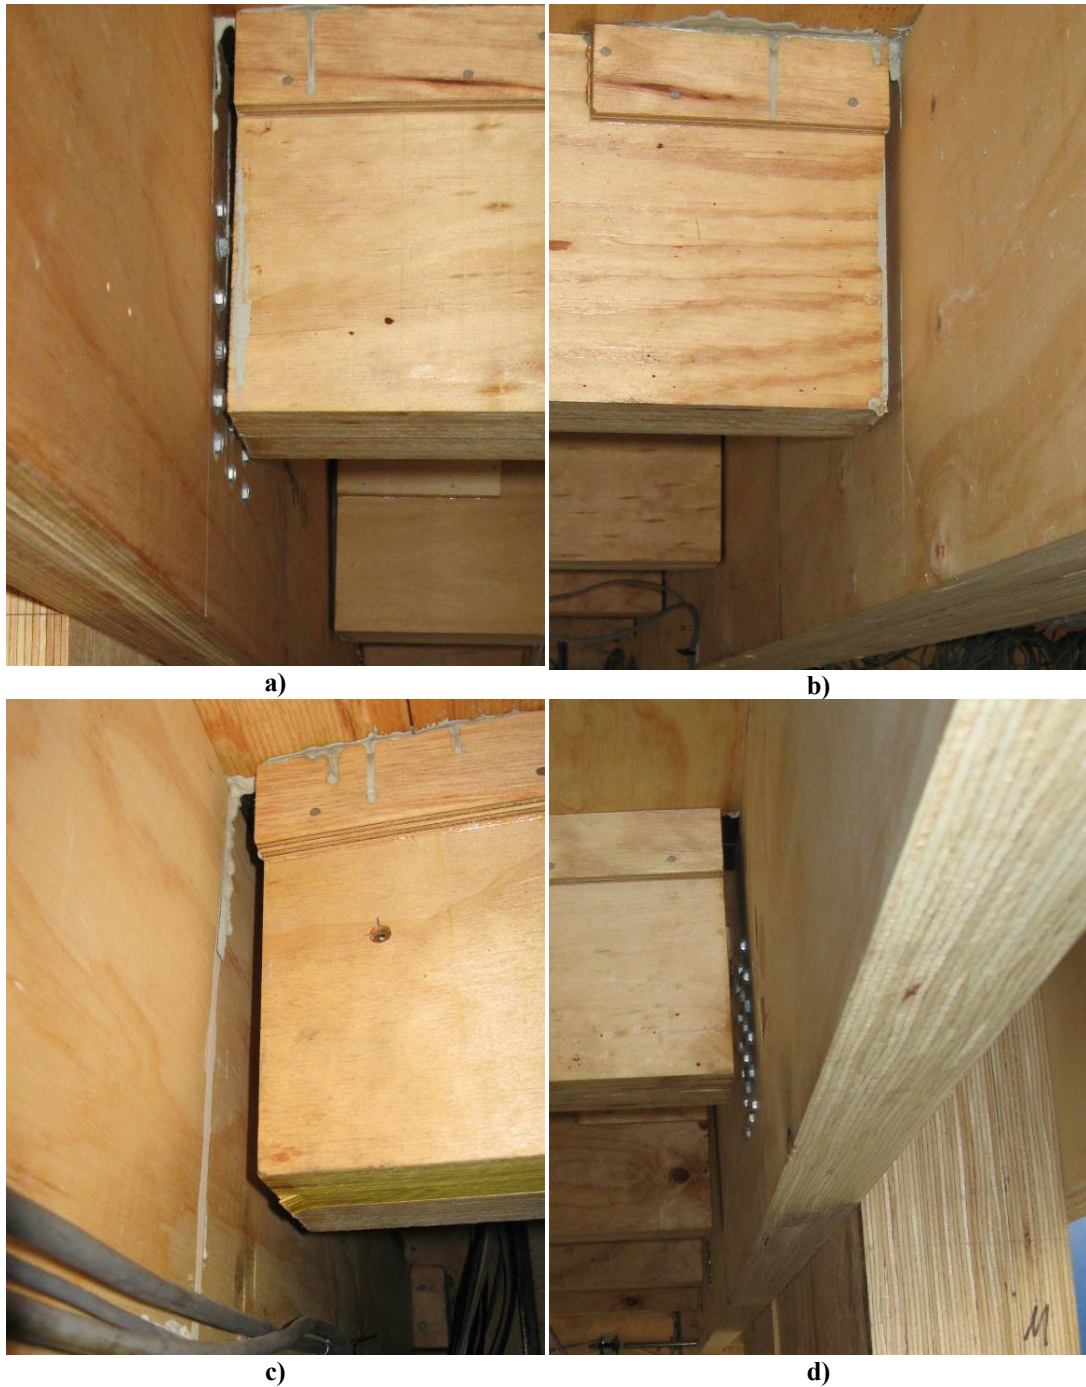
Floor joist supports at negative 2% Drift: a) West edge b) West side of primary beam c) East side of primary beam d) East edge
